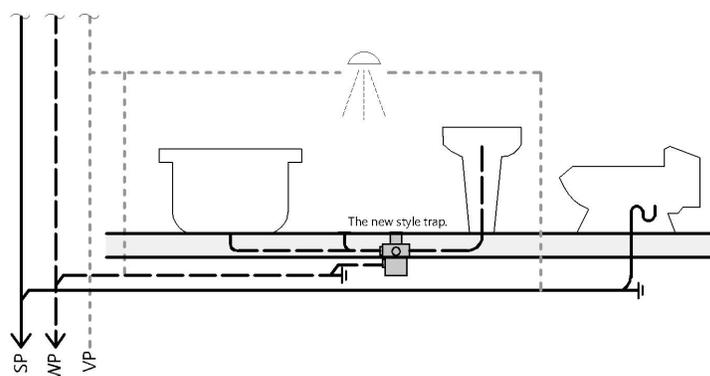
the plumbing configuration of the new style trap in bedroom⁽¹¹⁾
